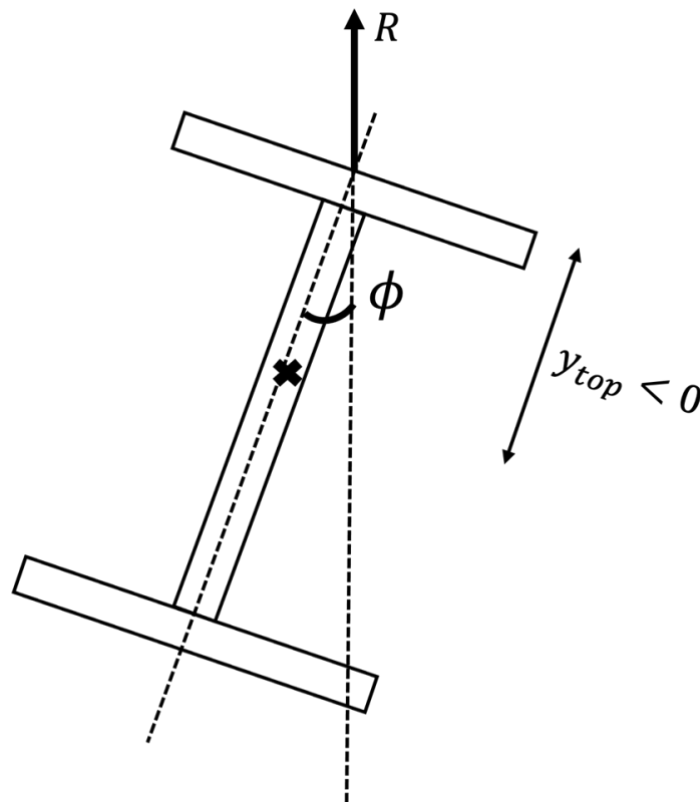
Free Body Diagram of Hanging Girder; Cross-Section at Support
